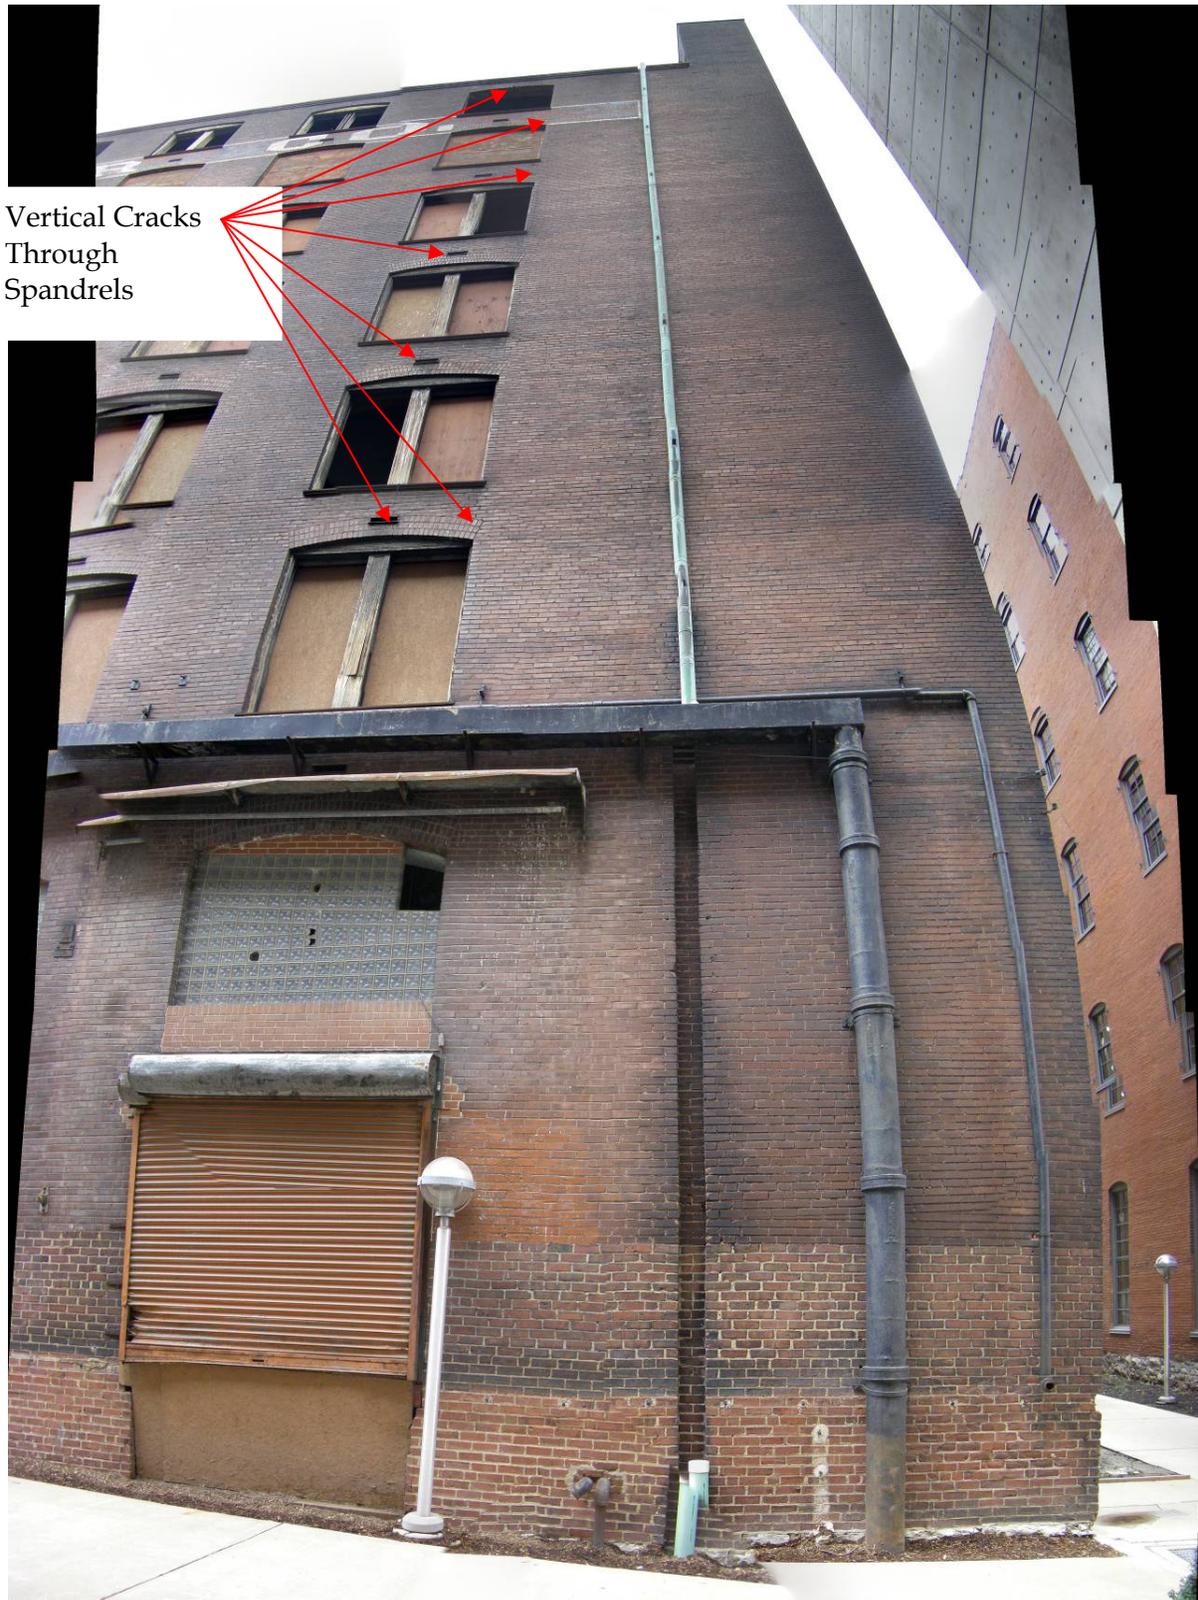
East Wall Crack Through Spandrels Near Southeast Corner (composite image)
